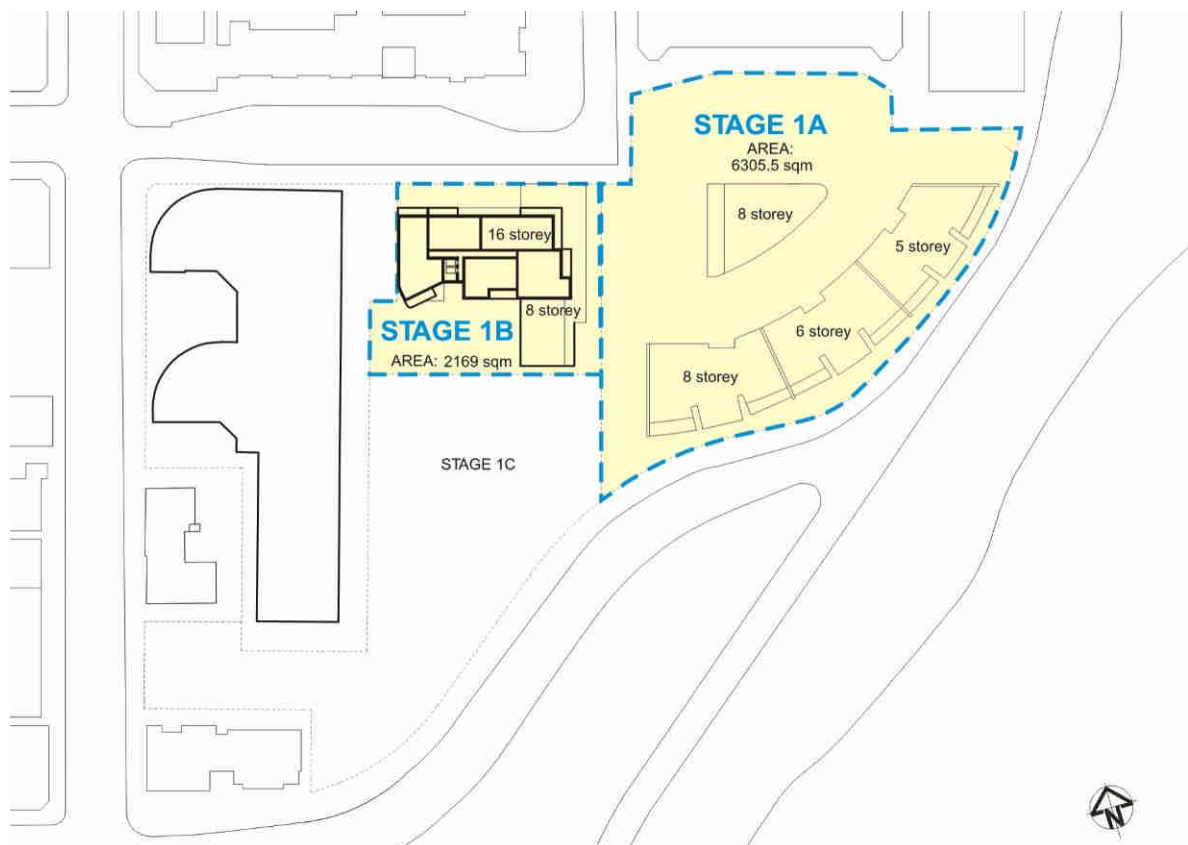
Subject site for Project Application (Stages 1A and 1B, the Royal Newcastle Hospital site)
